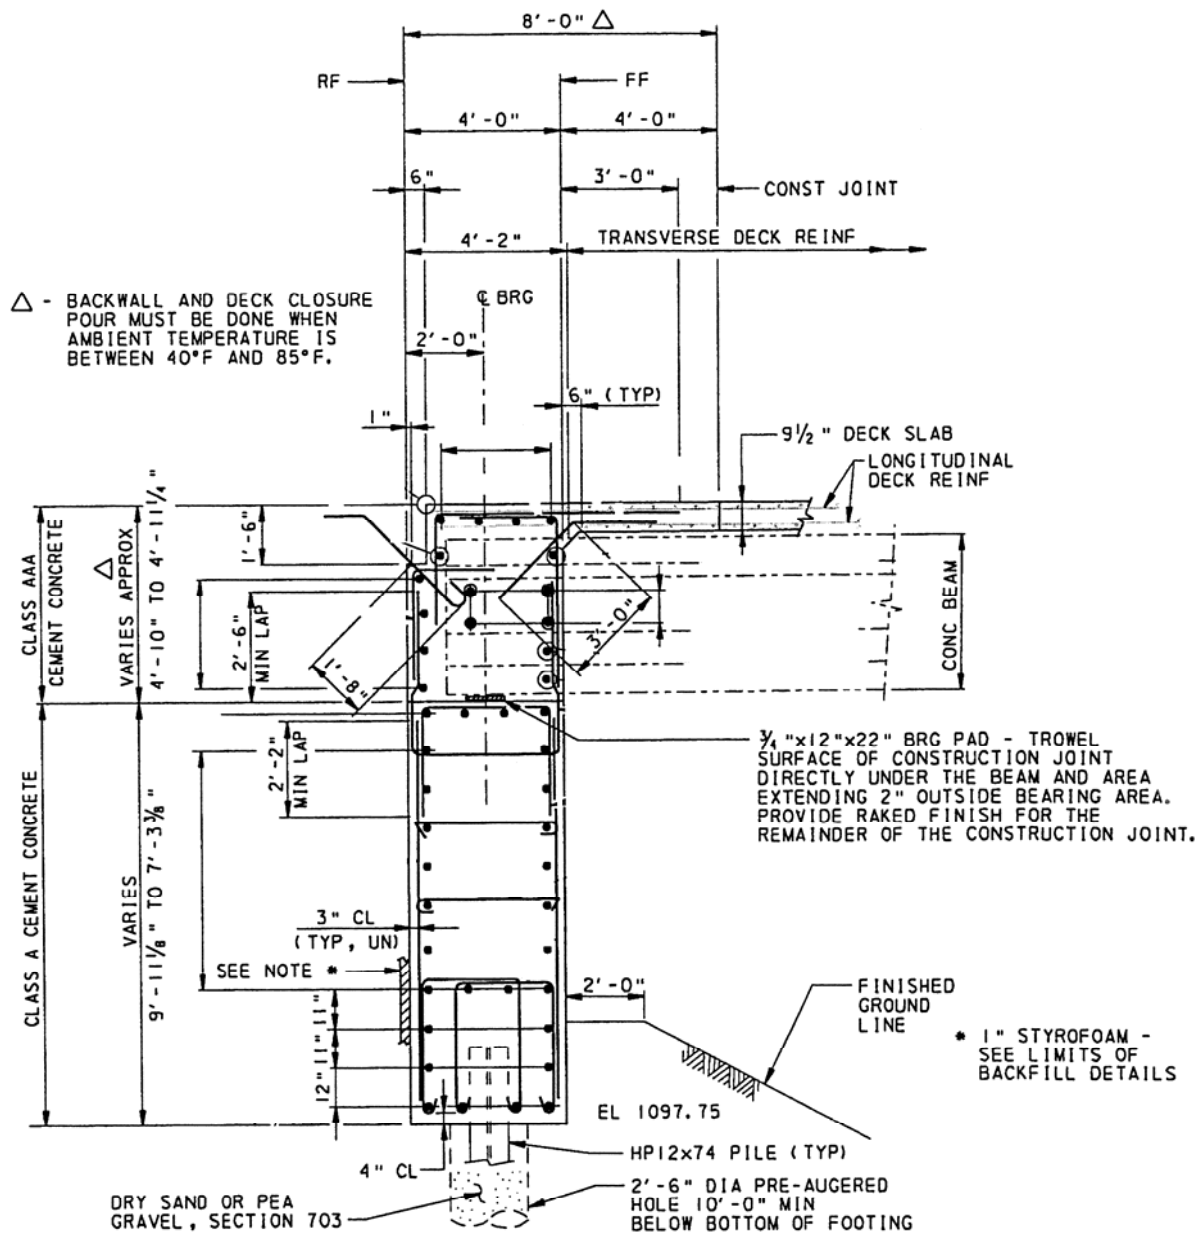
Cross-Section of Bridge 222 Abutment 1.
